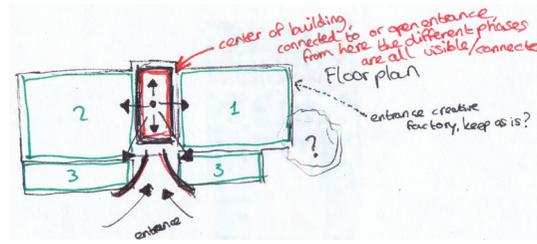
Sketch of the new building layout with a central hall that provides an overview of and access to the different building phases.
